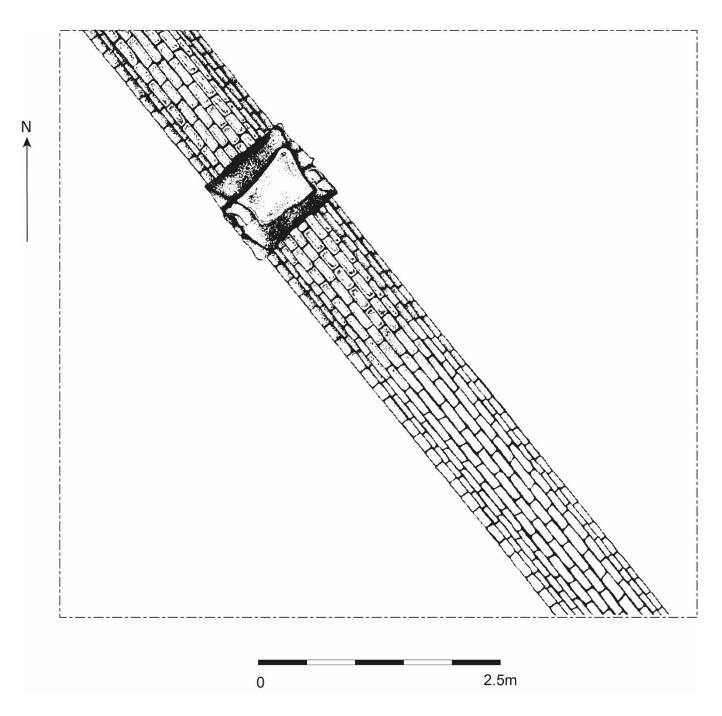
Plan of brick-built culvert (1012) revealed in Trench 1 showing construction detail
